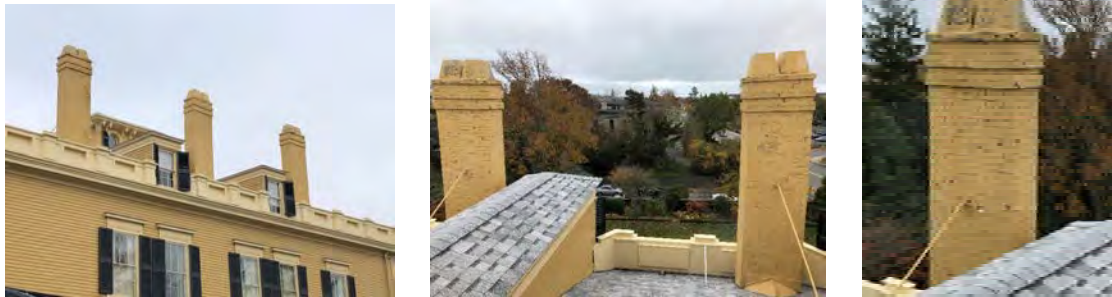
Chimneys: Three south chimneys (left); Looking south toward north face of south chimneys (center); Southeast chimney, looking southeast (right).
